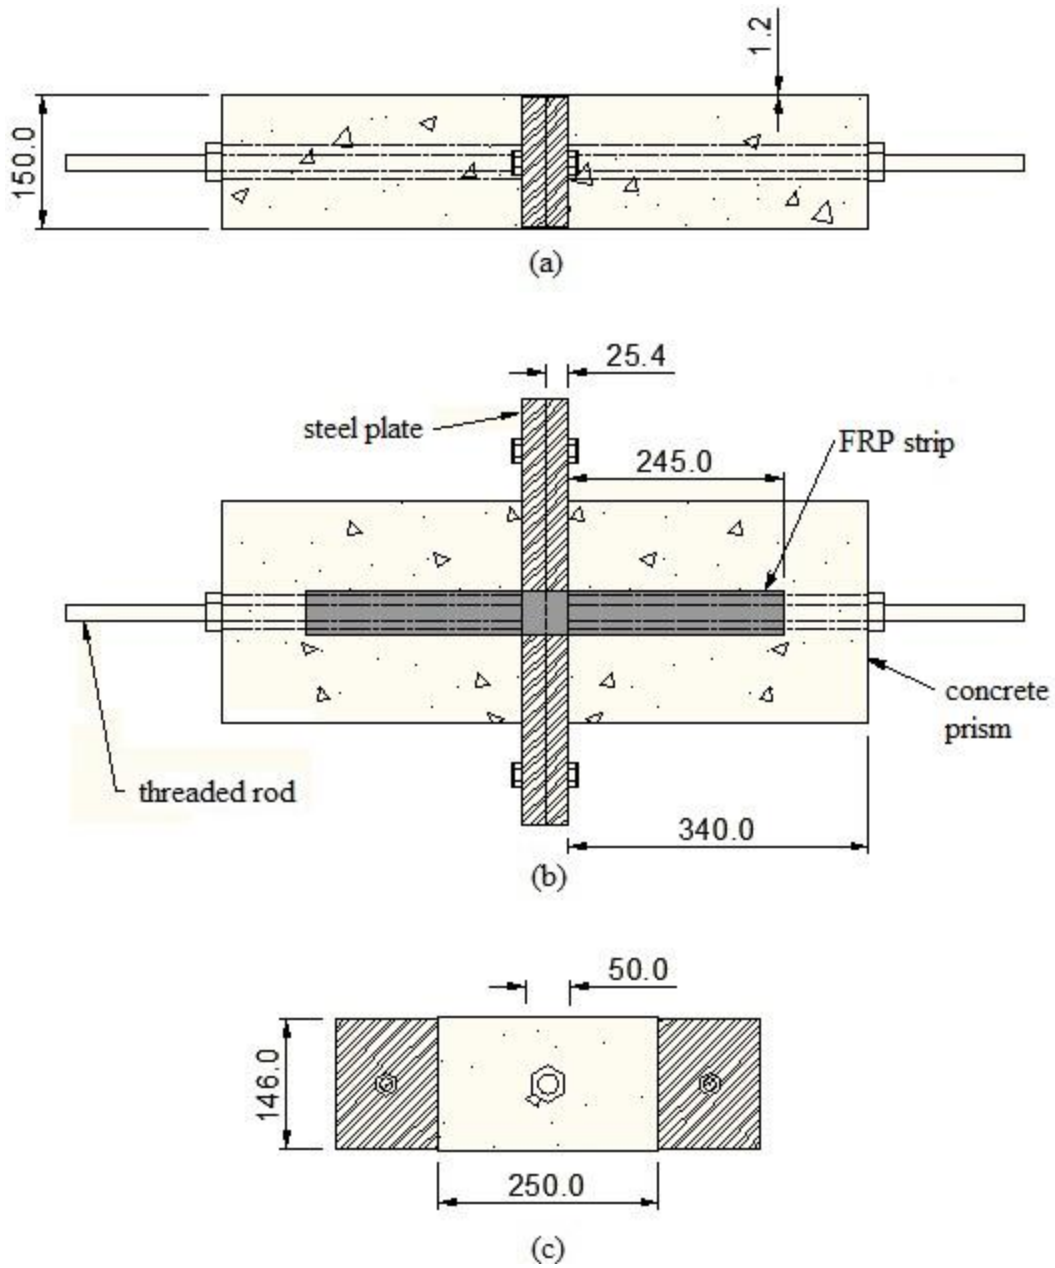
Typical specimen without anchors (a) Elevation view, (b) Top view and (c) End view
